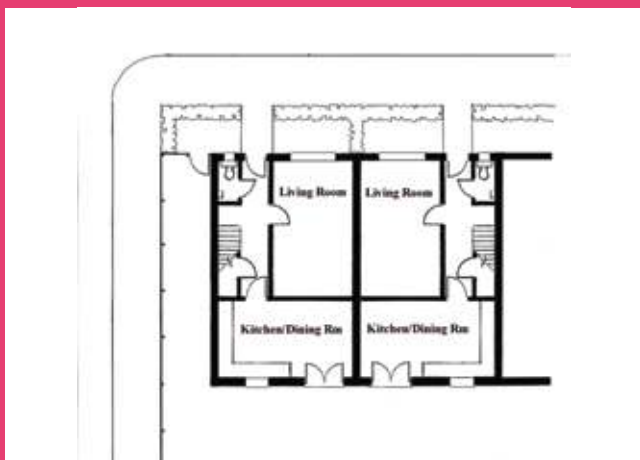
A common arrangement of terraces or semi-detached houses is to have a left-hand and right-hand version adjacent. This arrangement has been continued to the corner, resulting in a blank wall facing the side road (HATC / Jan Randall).
